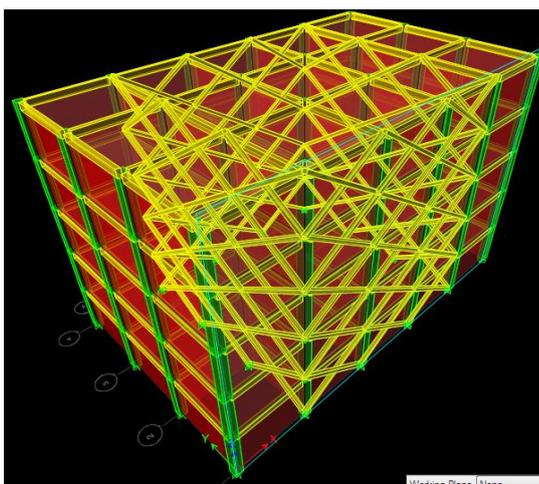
Frame with wall element and bracings in interior bays (Case 3)
